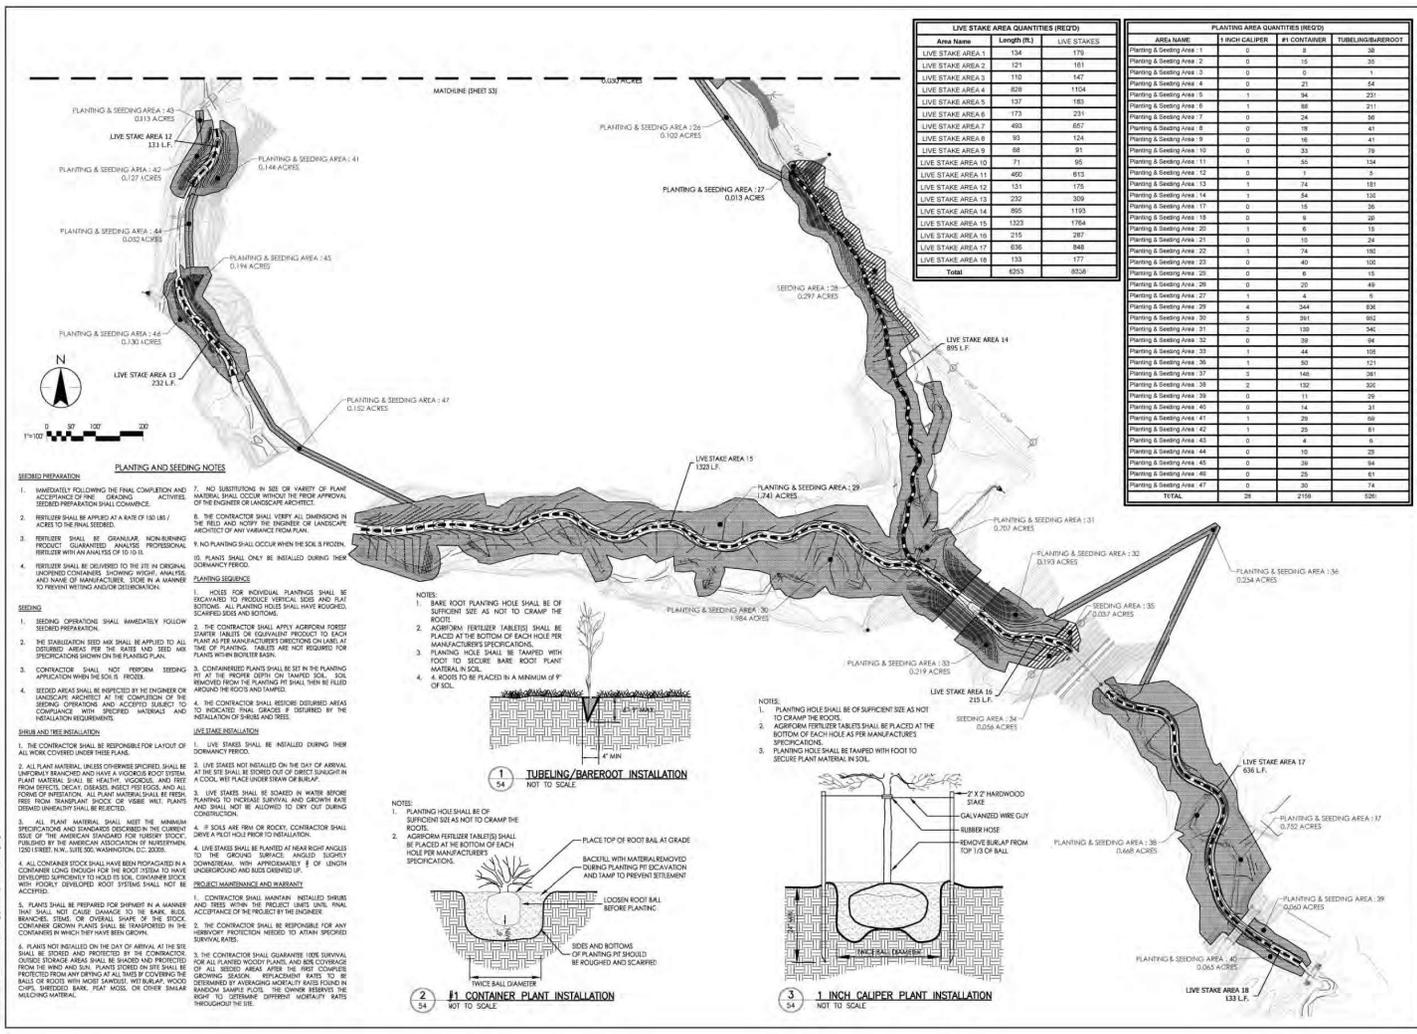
Construction Plan Set: PLANTING PLAN AND TABLES (2).
